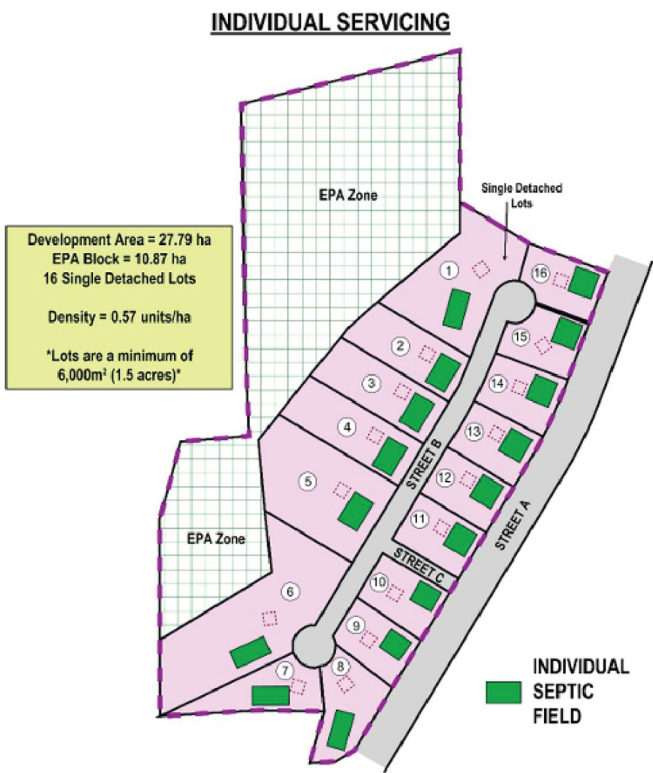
Site plan highlighting the level of density that can be achieved through private on-site servicing (WSP, 2019)
